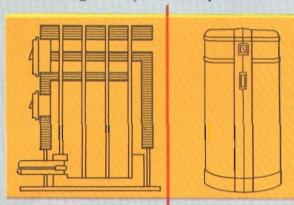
Boiler designed for coal, equipped with high pressure conversion oil burner.
